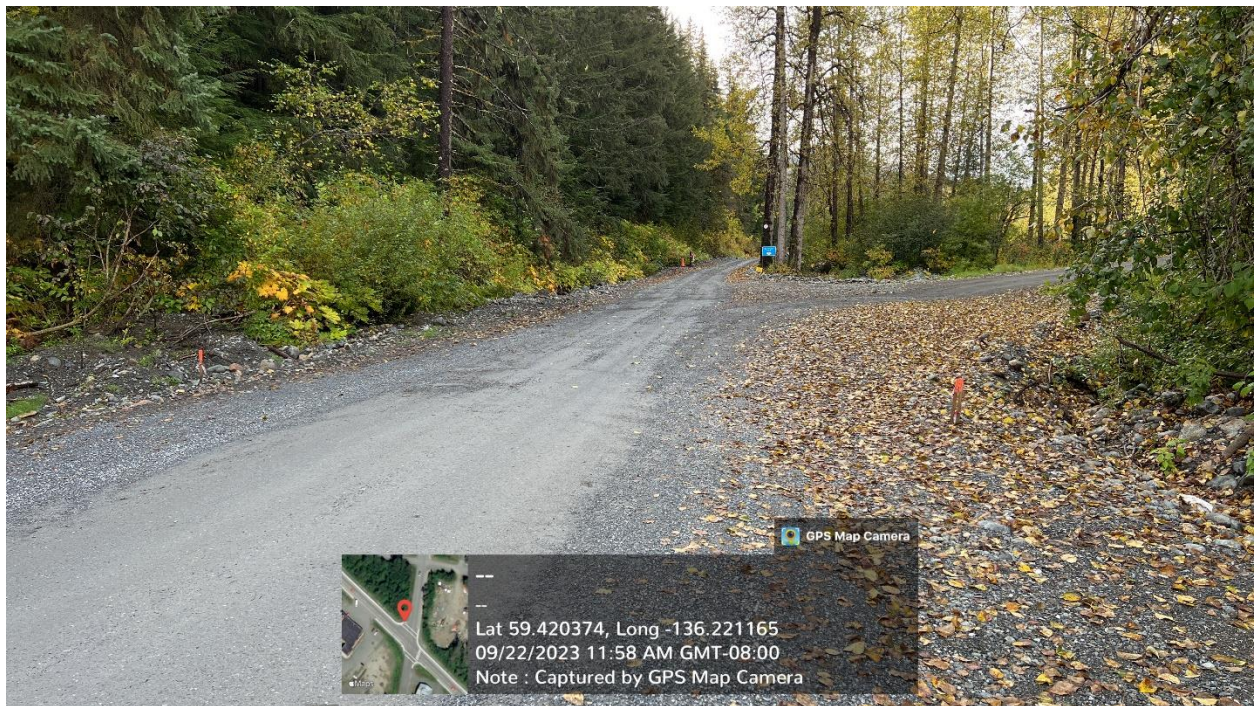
Porcupine Trail Road Phase I stop of work, photo facing end of road.
